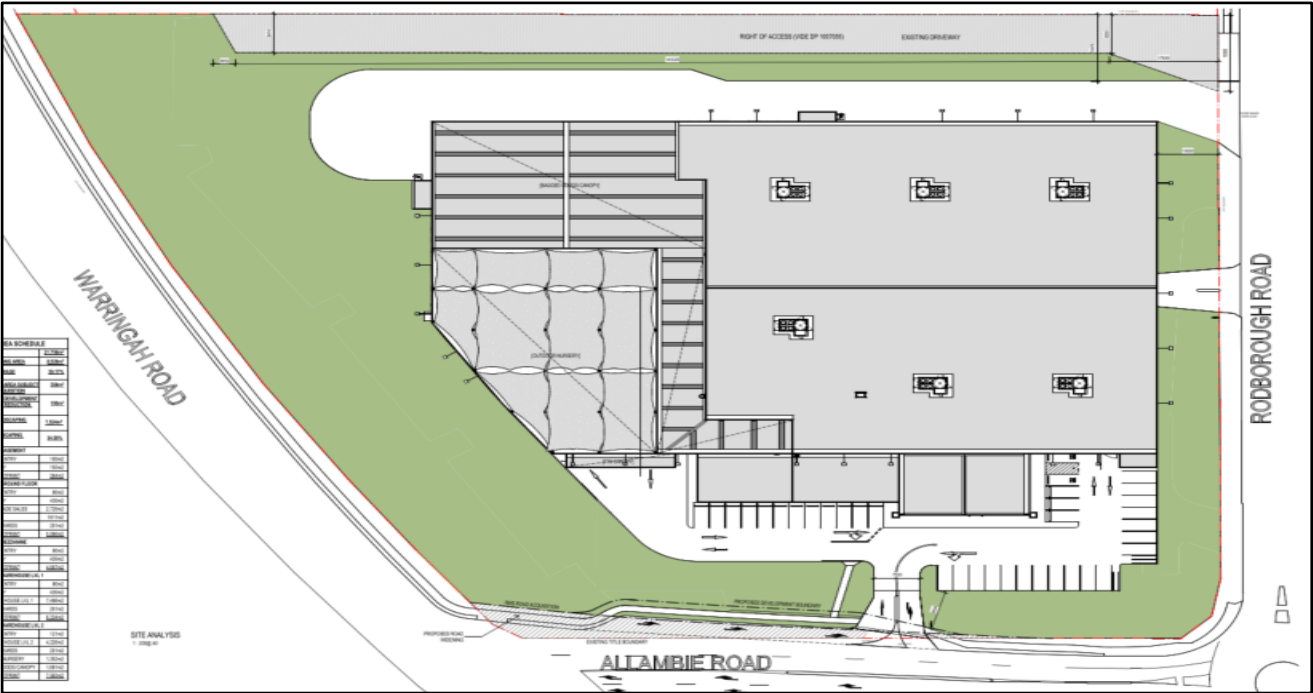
Site Plan (Source: Michael Carr Architect, 2020)
